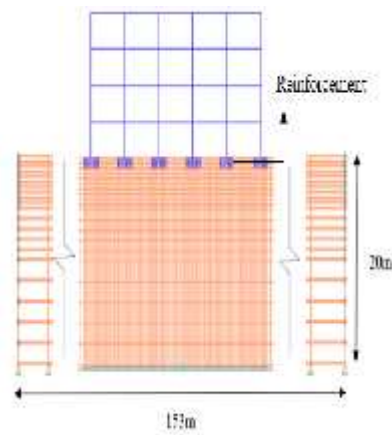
Front view of Space frame resting on reinforced soil (reinforcement below all footings).
